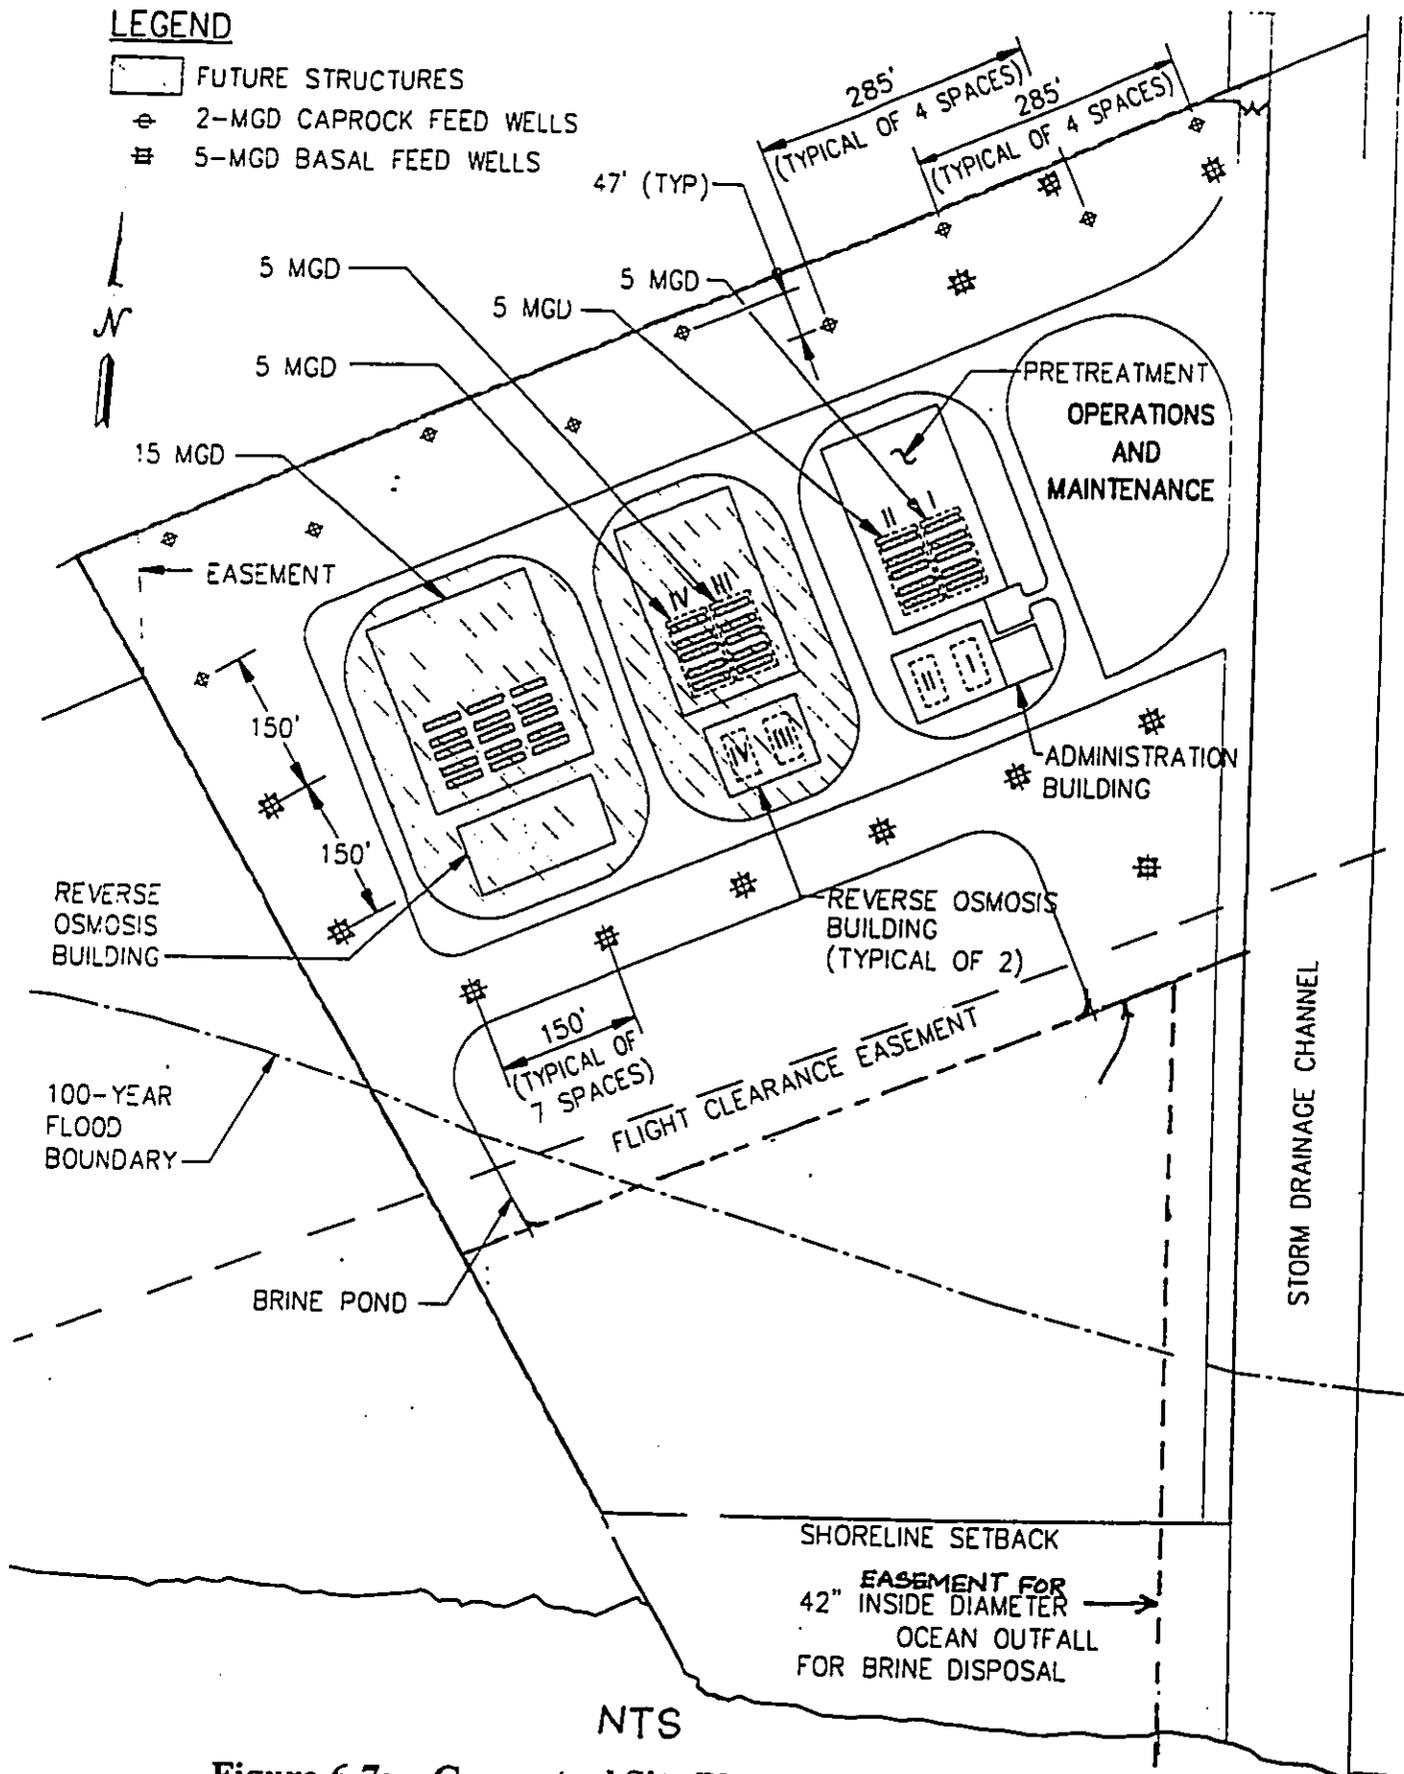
Conceptual Site Plan for a Desalination Facility
